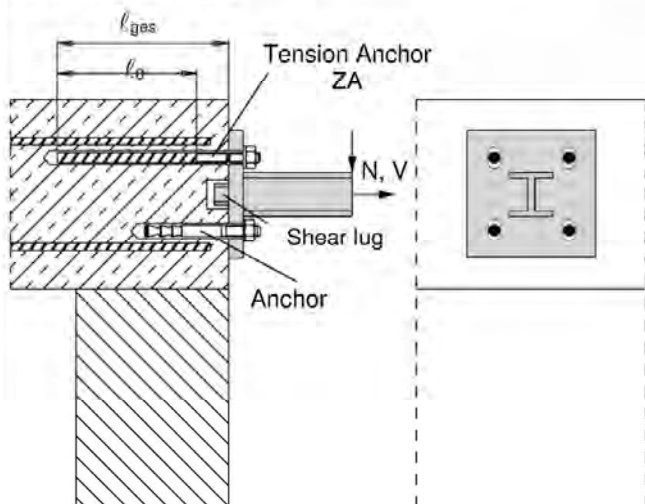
Overlapping joint of a column stressed in bending to a foundation
